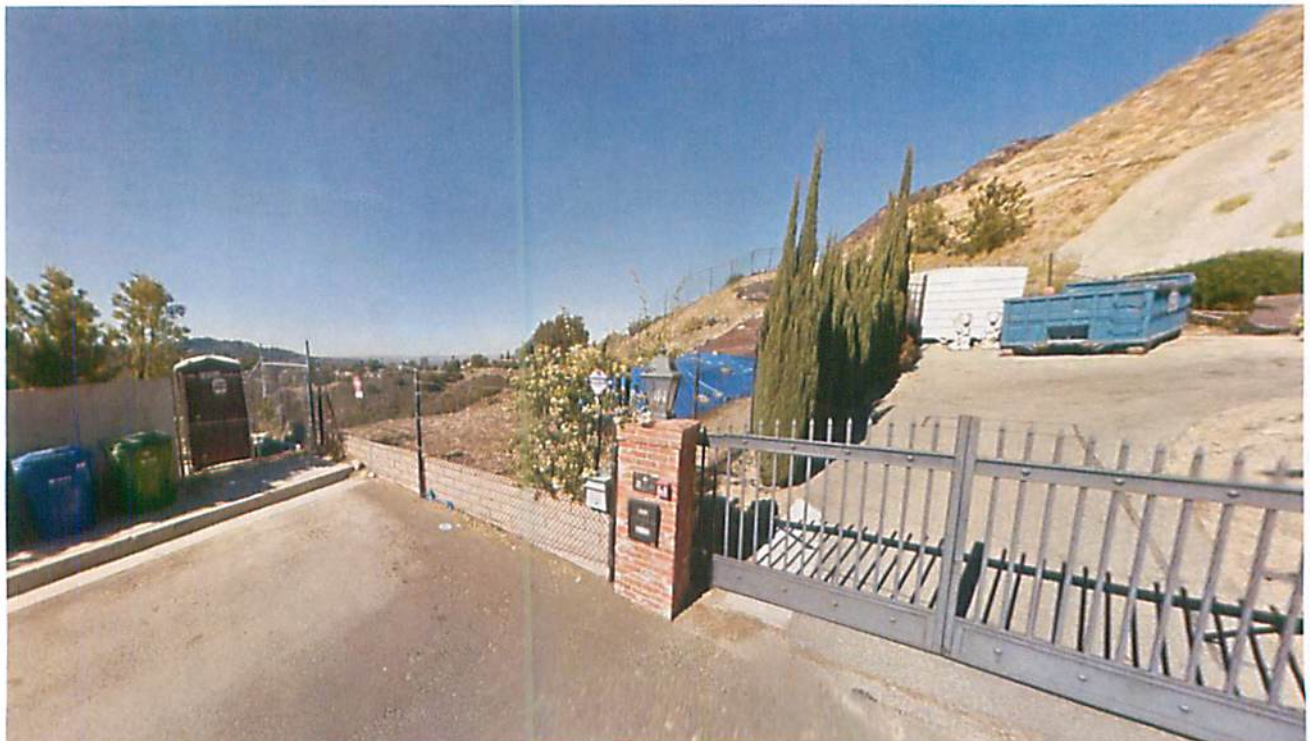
View of location of proposed driveway to Project site from W. Innsdale Drive
